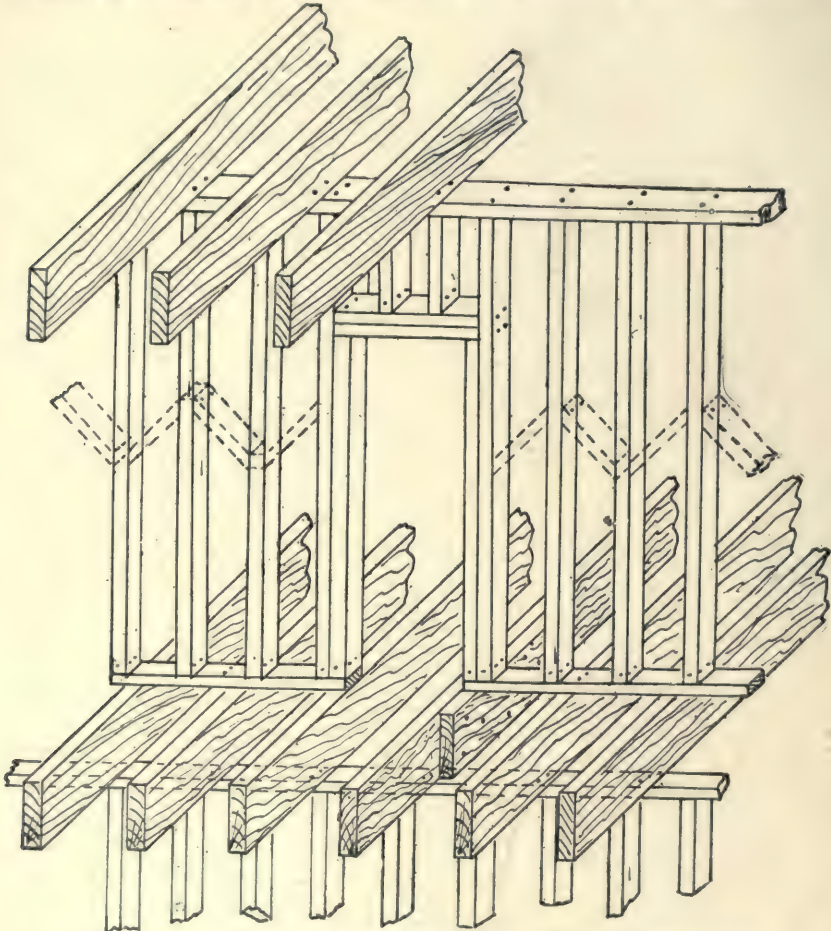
A Framed Inside Partition Crossing the Beams at Right Angles.
